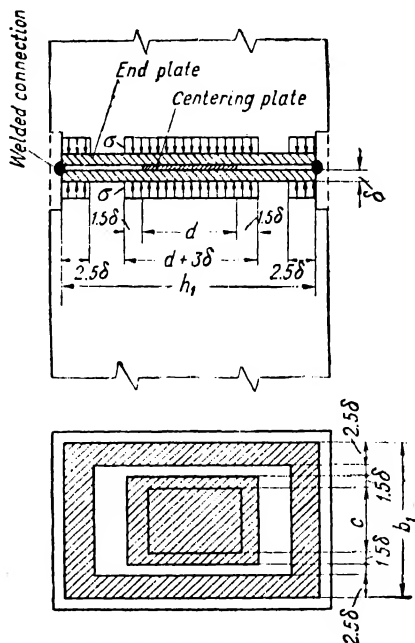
Normal stresses in the concrete of a joint with centering plates
